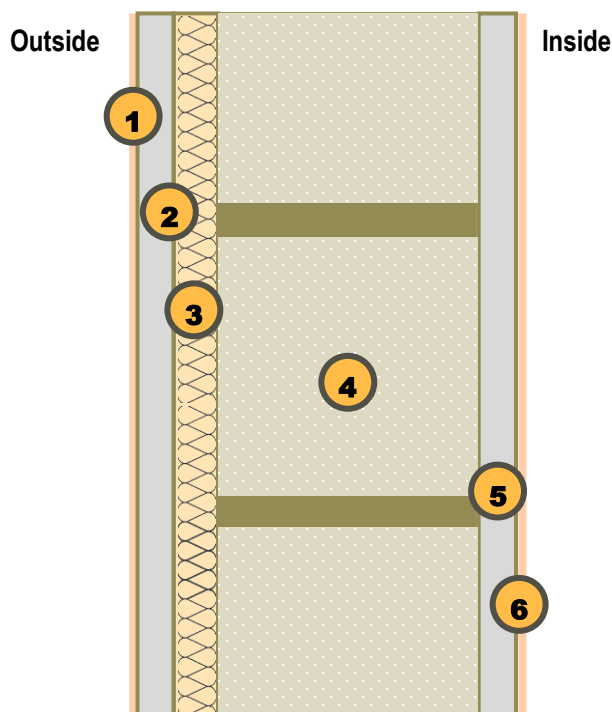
Construction detail for wall assembly: AAC block with external insulation
